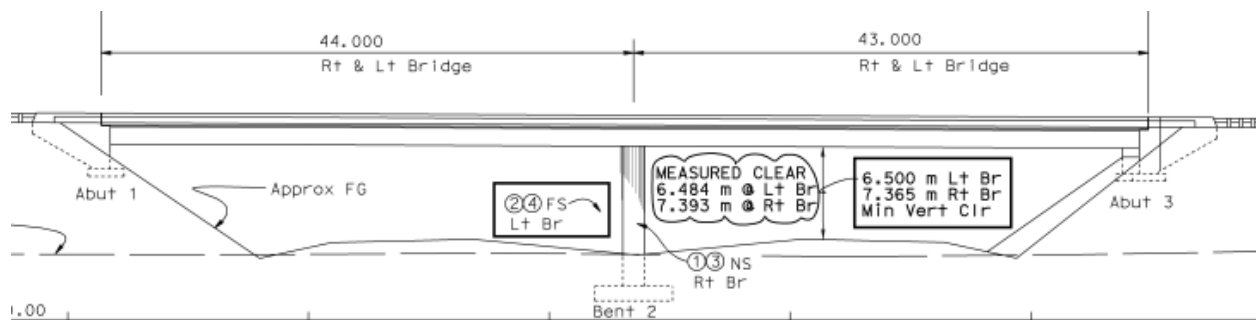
Schematic Elevation view of R14L bridge (Caltrans)
